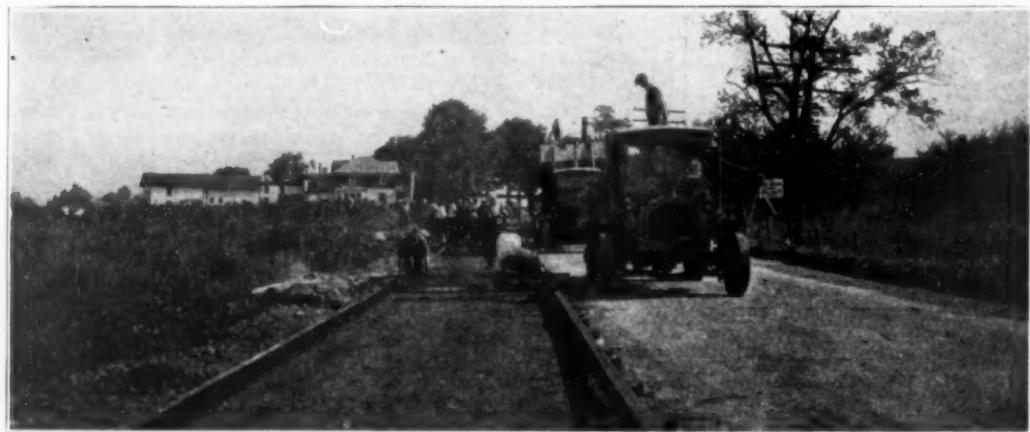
Subgrade for New 8-ft. Strip, the Old Pavement and Subgrade Tester
